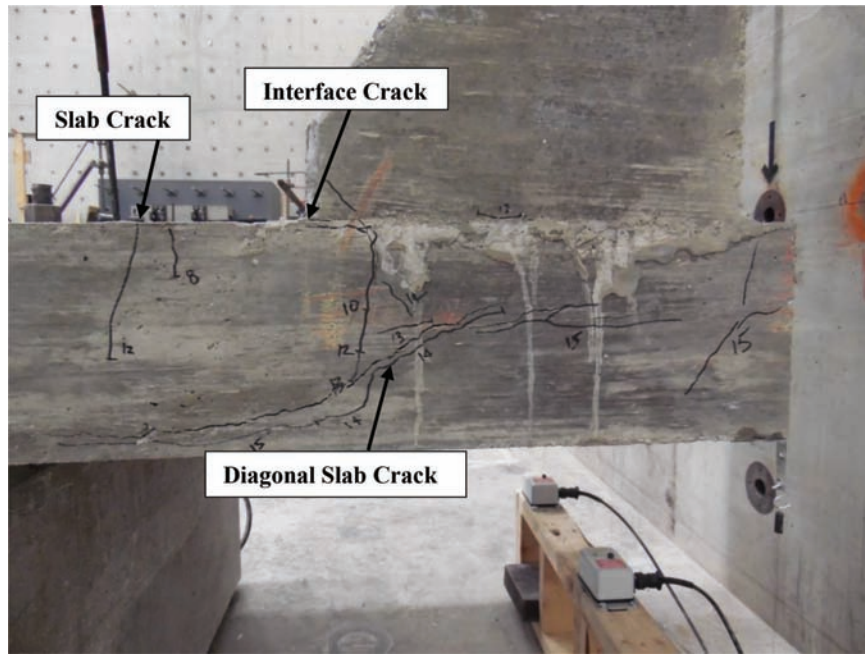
Strip Specimen 4 cracking at 15 kip.
